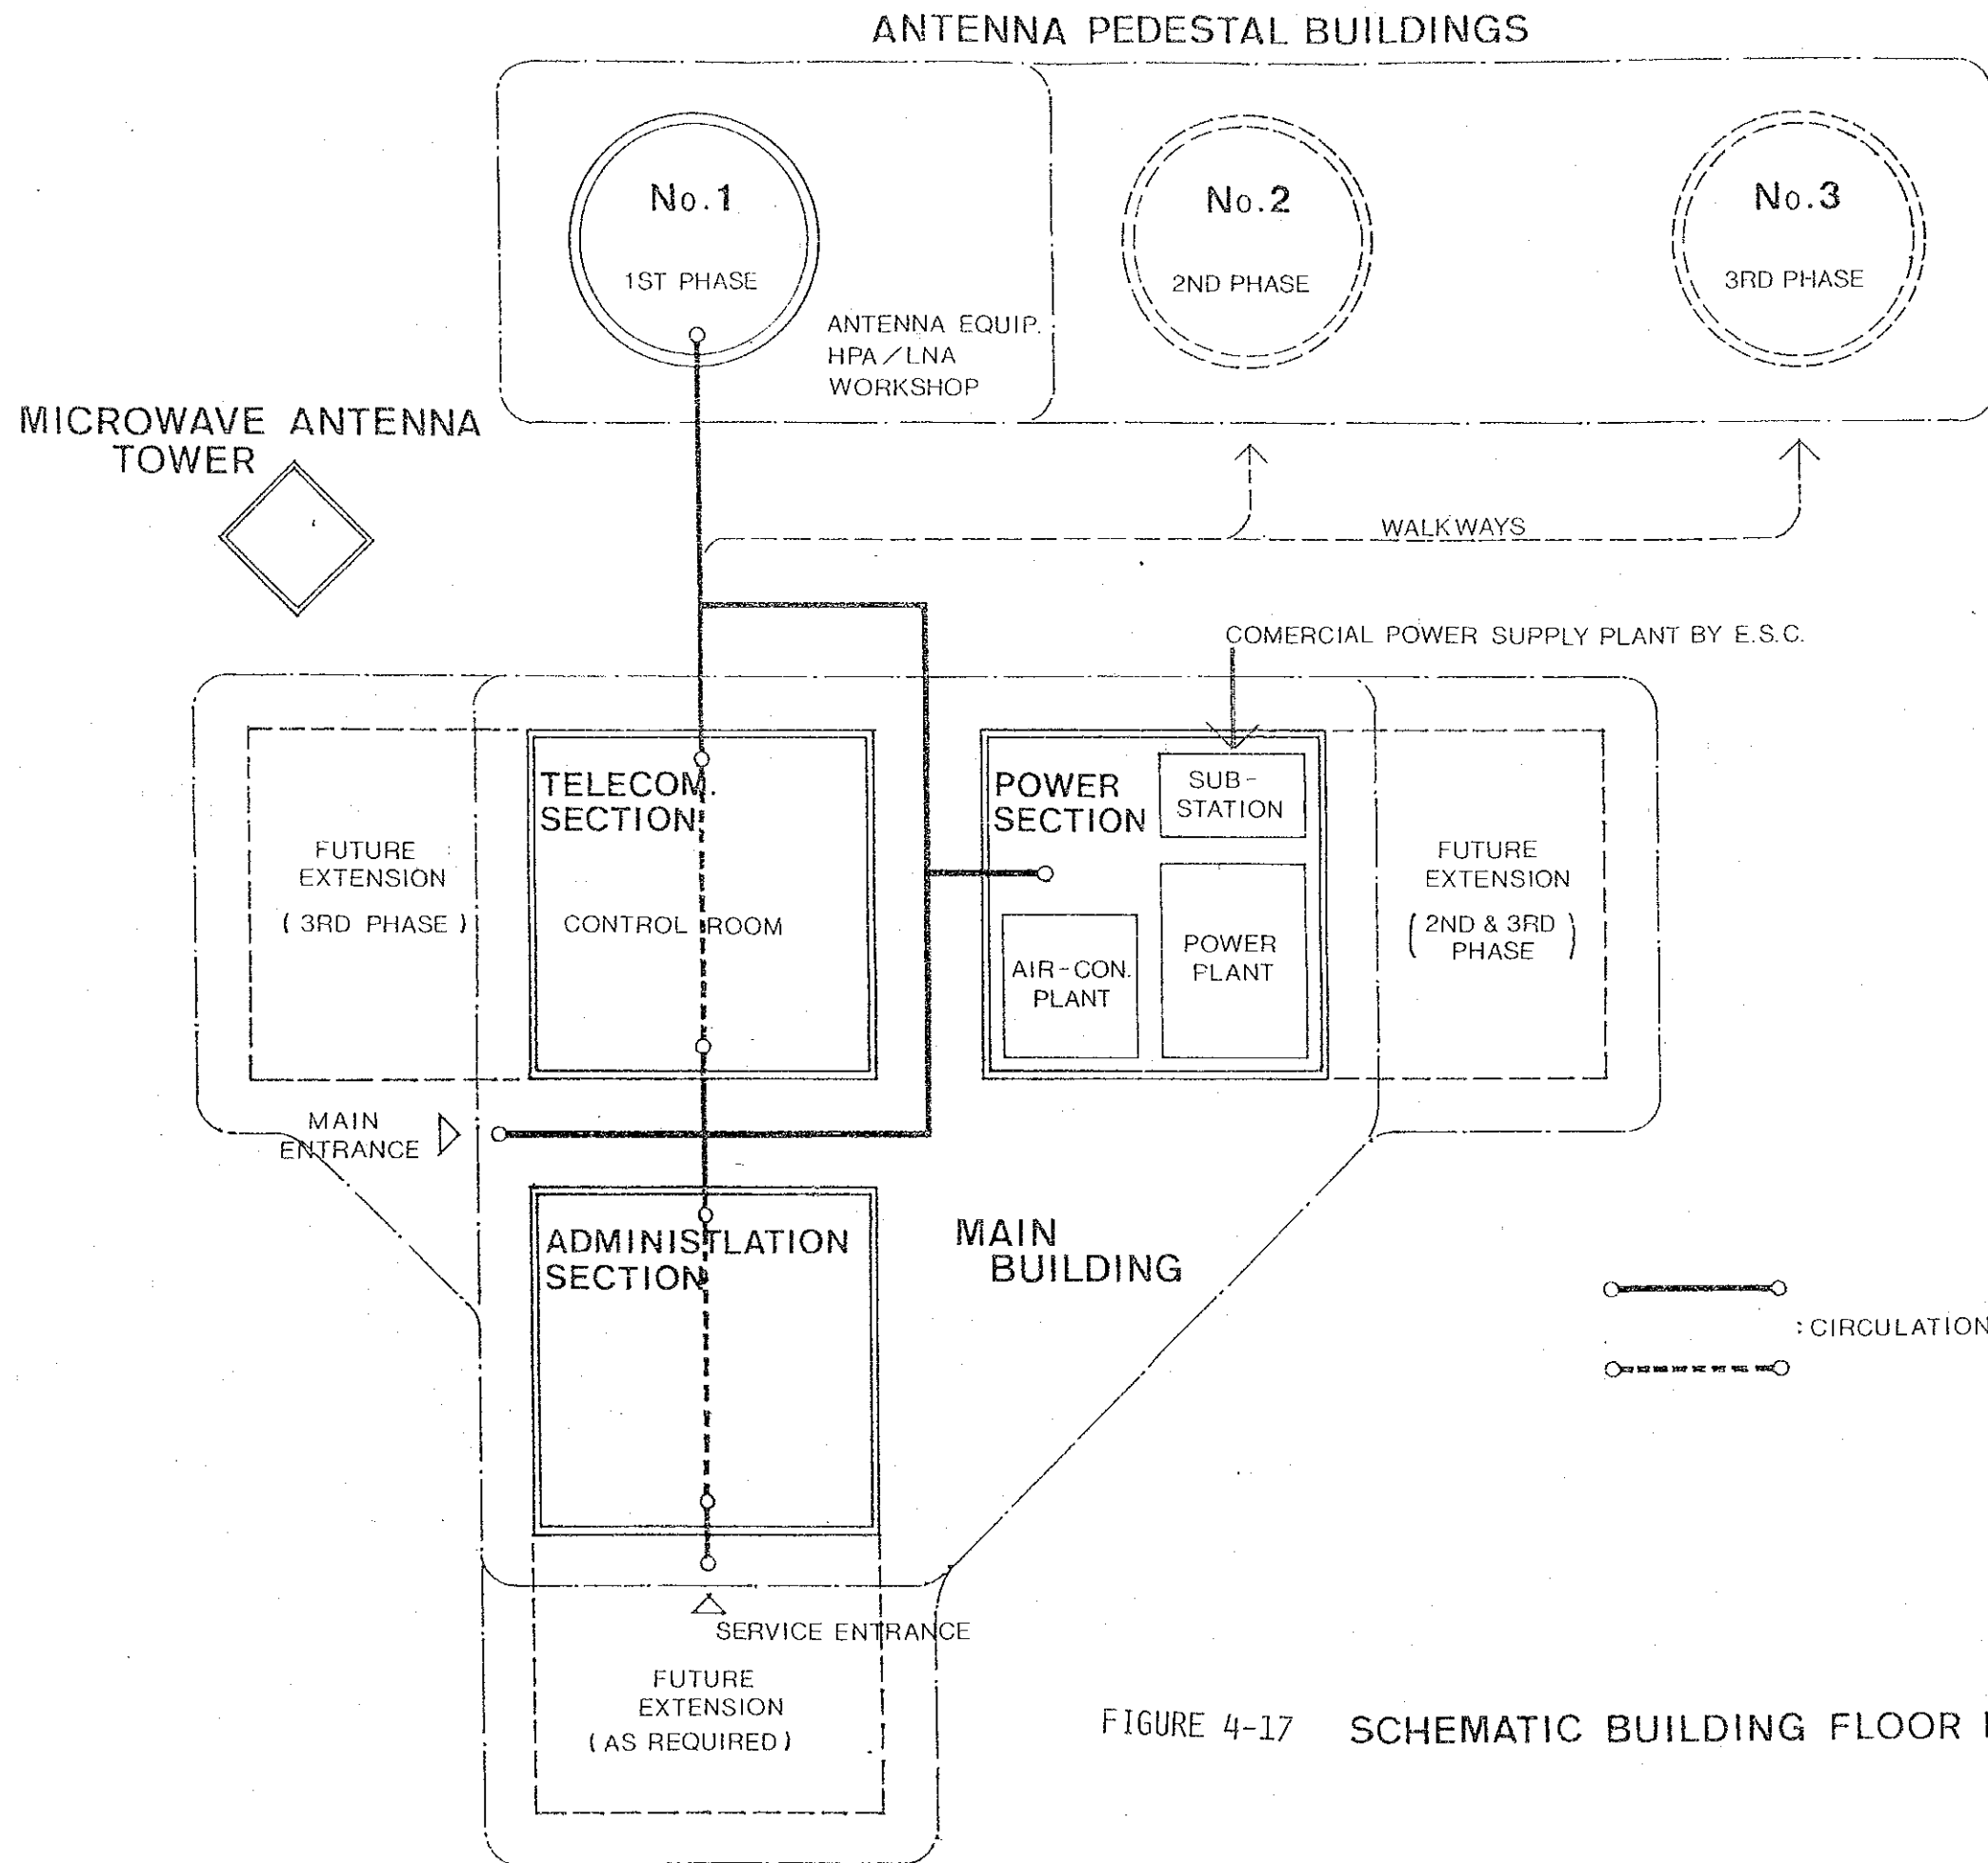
SCHEMATIC BUILDING FLOOR PLAN
